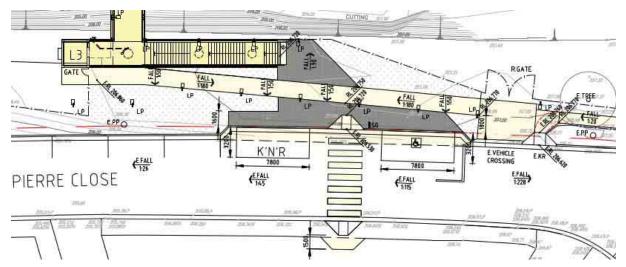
Access arrangement to Lift 3 and Stair 3 from Pierre Close (including new kiss 'n' ride and disabled car parking)
